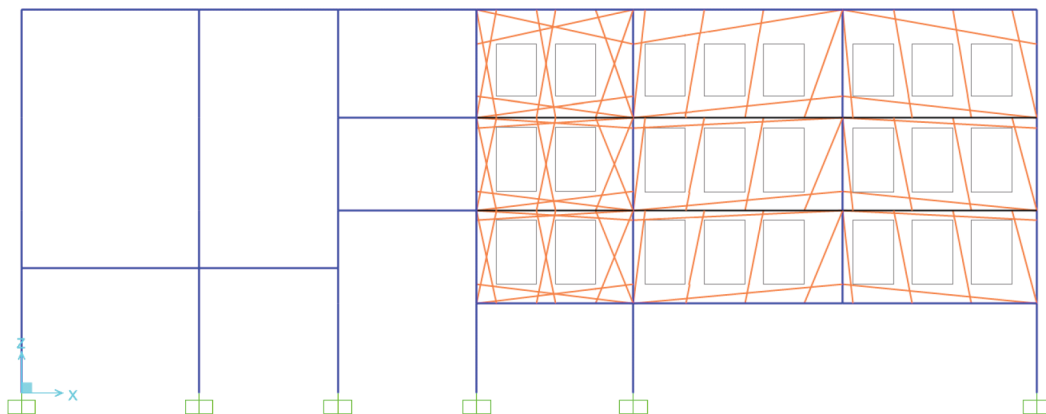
Haskett House frame structure with compressive strut elements for representing infill walls.
